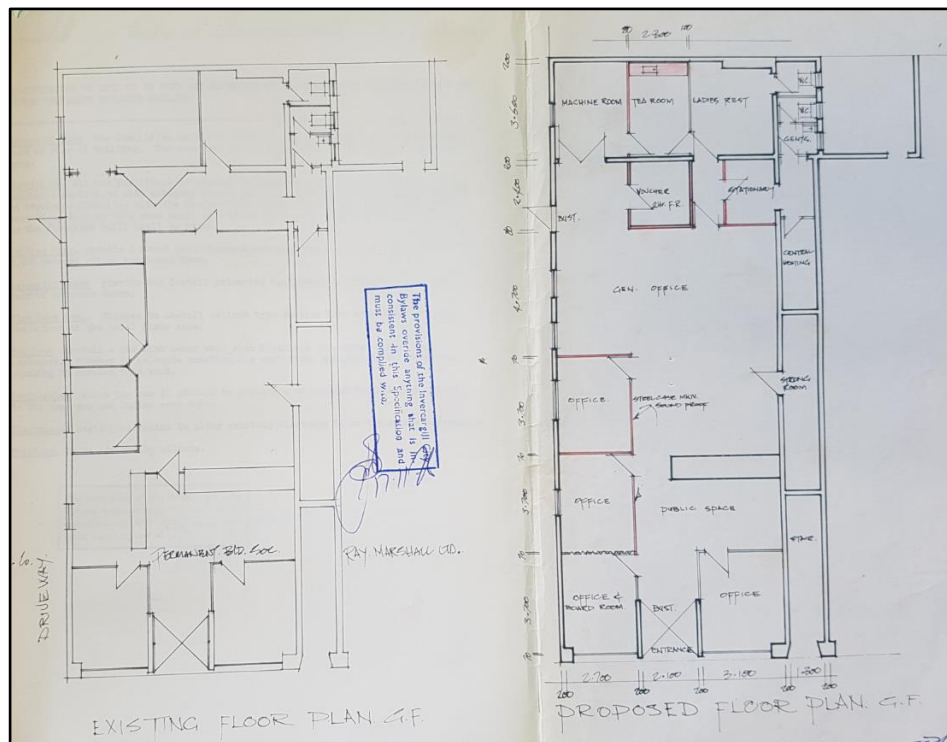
Details from 1976 plan of the Temple Chambers at 45-49 Esk Street, showing the existing first floor plan of the eastern shop (left) and the alterations to first floor plan of the eastern shop (right) (V. R. Jackson, 1976).
